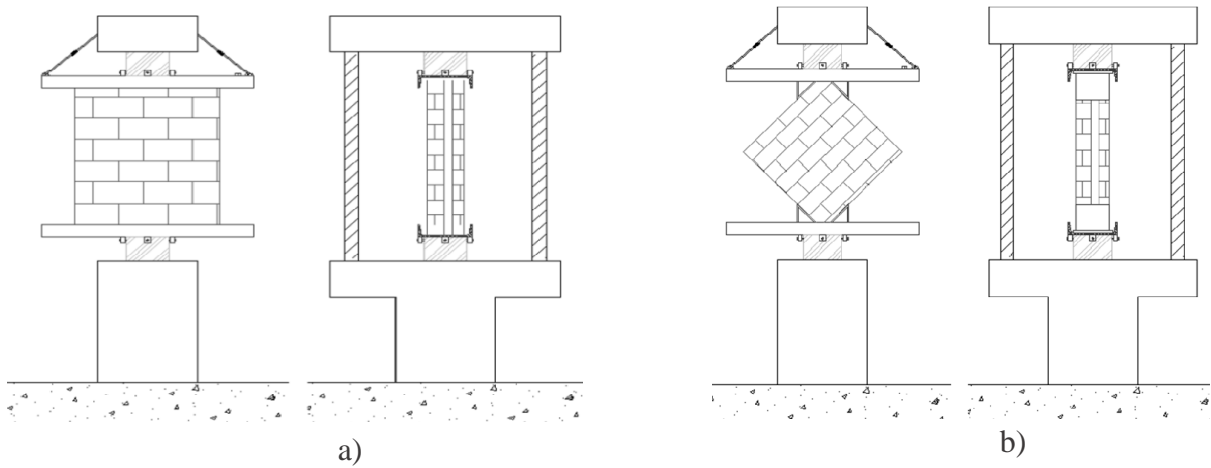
Hollow clay brick masonry wall specimens [2]
